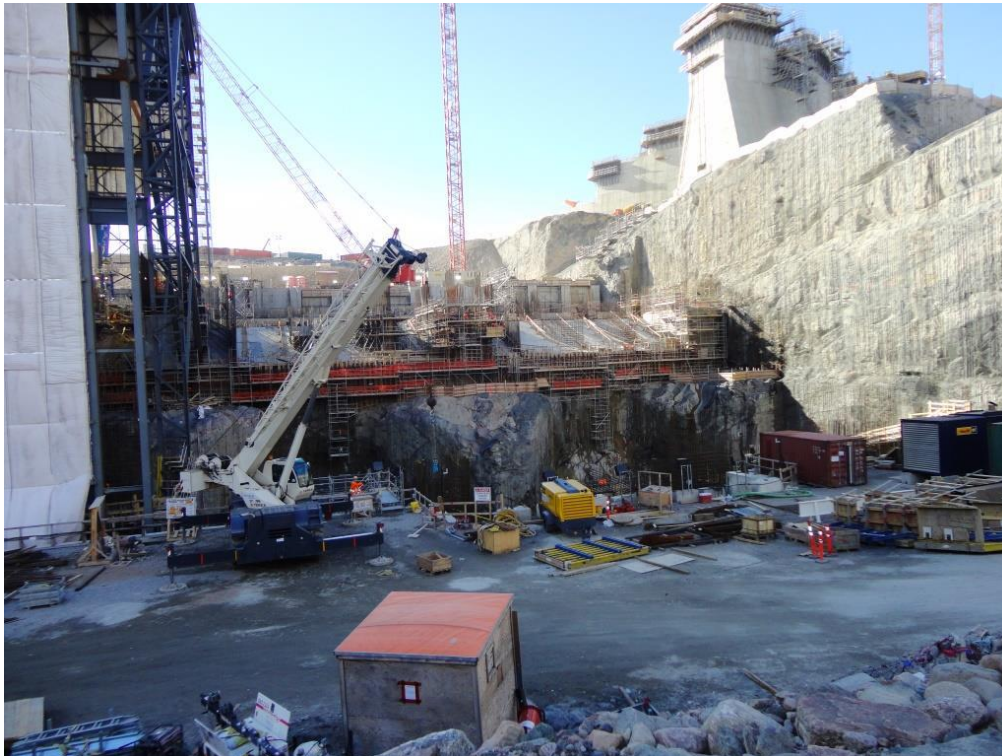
Powerhouse. Rock excavations for Units 3 and 4 are visible in the centre of the photo..The concrete transition dam is visible at the upper right side of the photograph.
